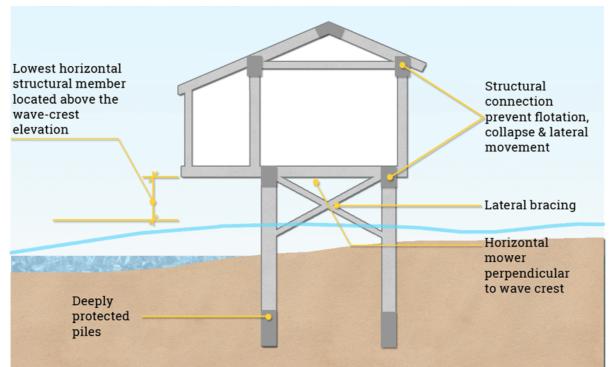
Image showing introduction of bracings between columns (credit: andhitapradipta.github.io)
